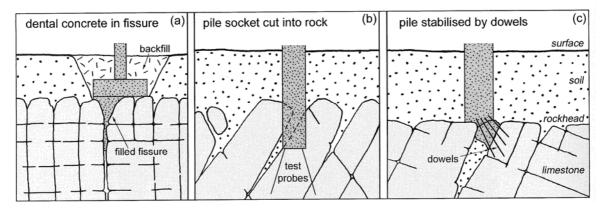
Pile integrity in karst achieved by treatment of rockhead fissures (a) dental concrete filling in a wide fissure, (b) pile socket cut into rock and probed beneath, (c) pile stabilised by dowels through concrete fill (after Sowers, 1986)
